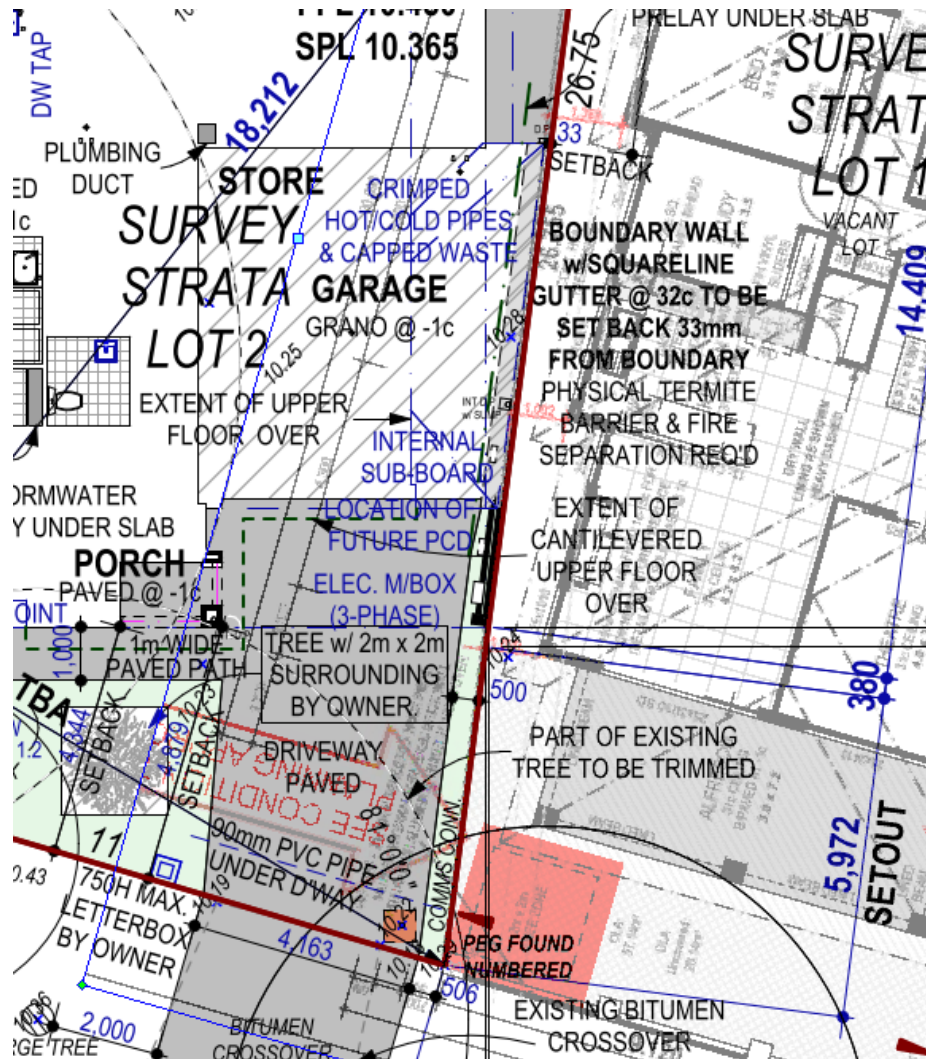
Boundary wall location. Boundary wall is to the right hand side of garage on survey strata lot 2. The adjoining lot is on the right.
